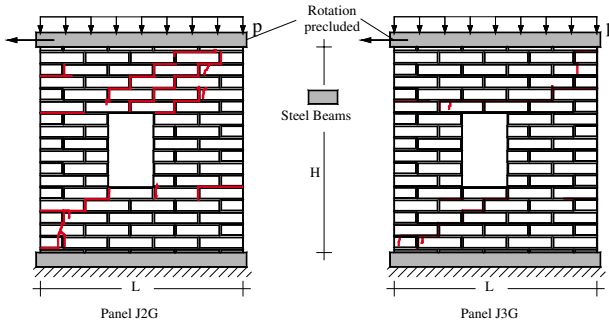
Windowed masonry shear wall by Raijmakers and Vermeltoort.
